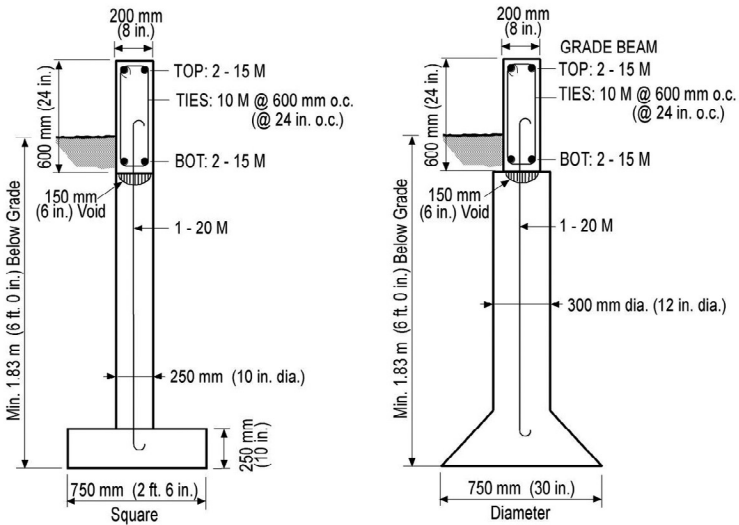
Pile/Pier and Footing Foundation Standards
